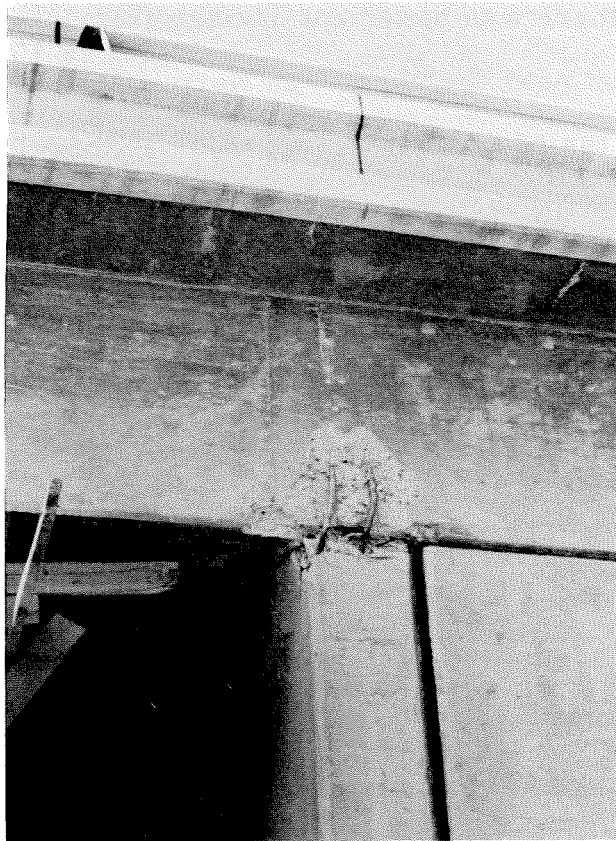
Damage to northern pier wall of the Roxford Street undercrossing, Golden State freeway.
